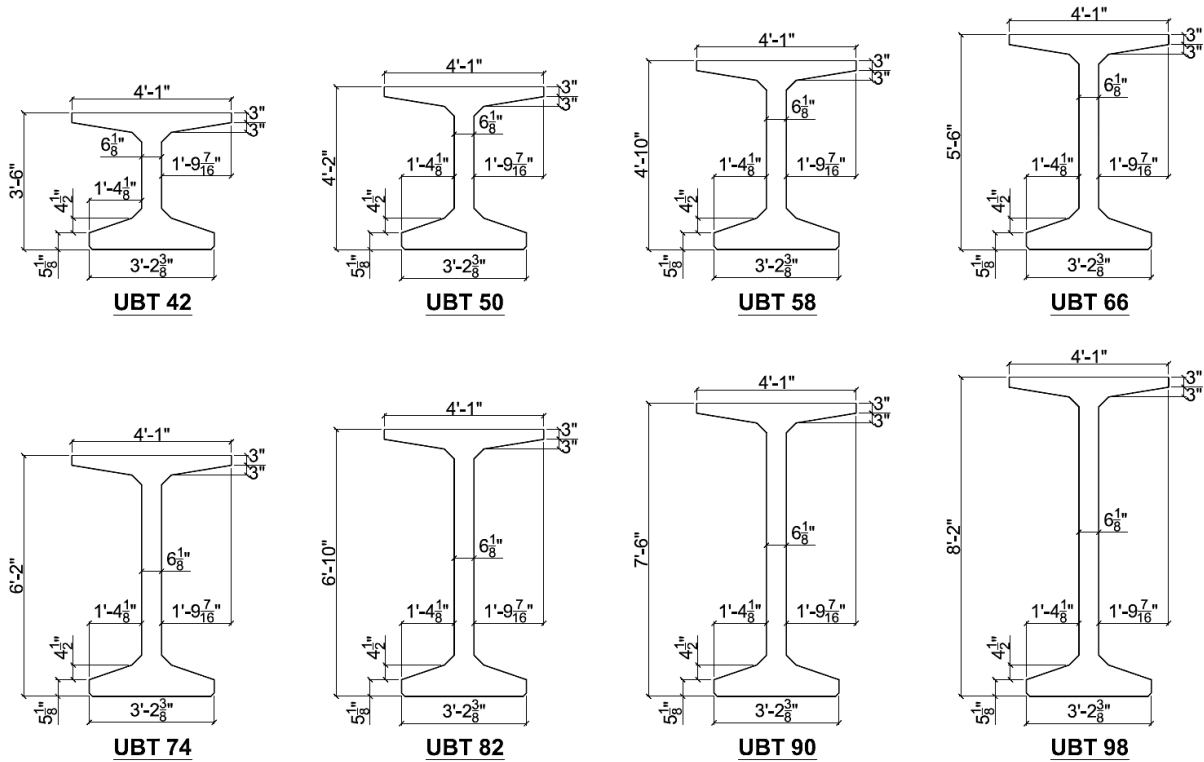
Precast bulb-tee girders (Source: UDOT 2010b)
